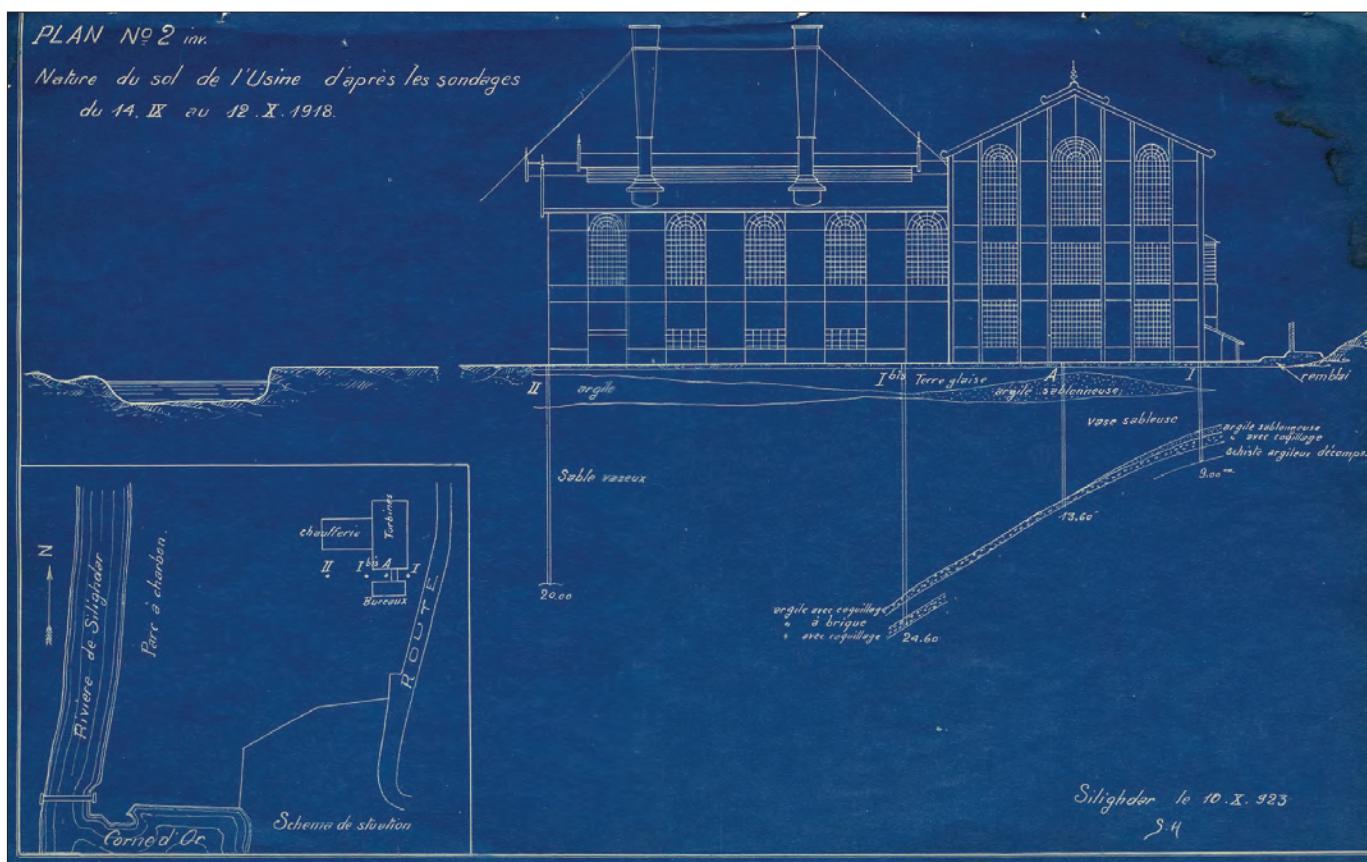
İstanbul, Silahtarağa Power Plant, site cross-section from the 1910s showing the structural weakness of the site's soil.
